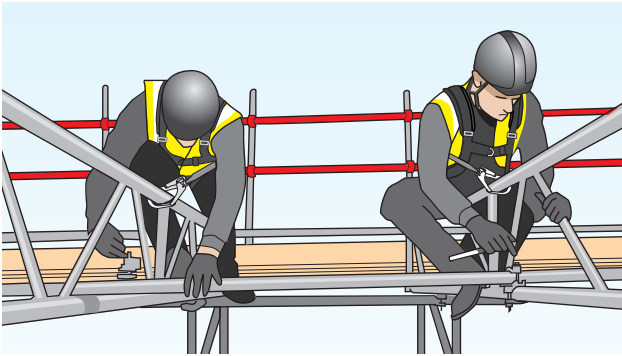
Scaffolders crabbing beams to fix a chord tie maintaining continual attachment.
